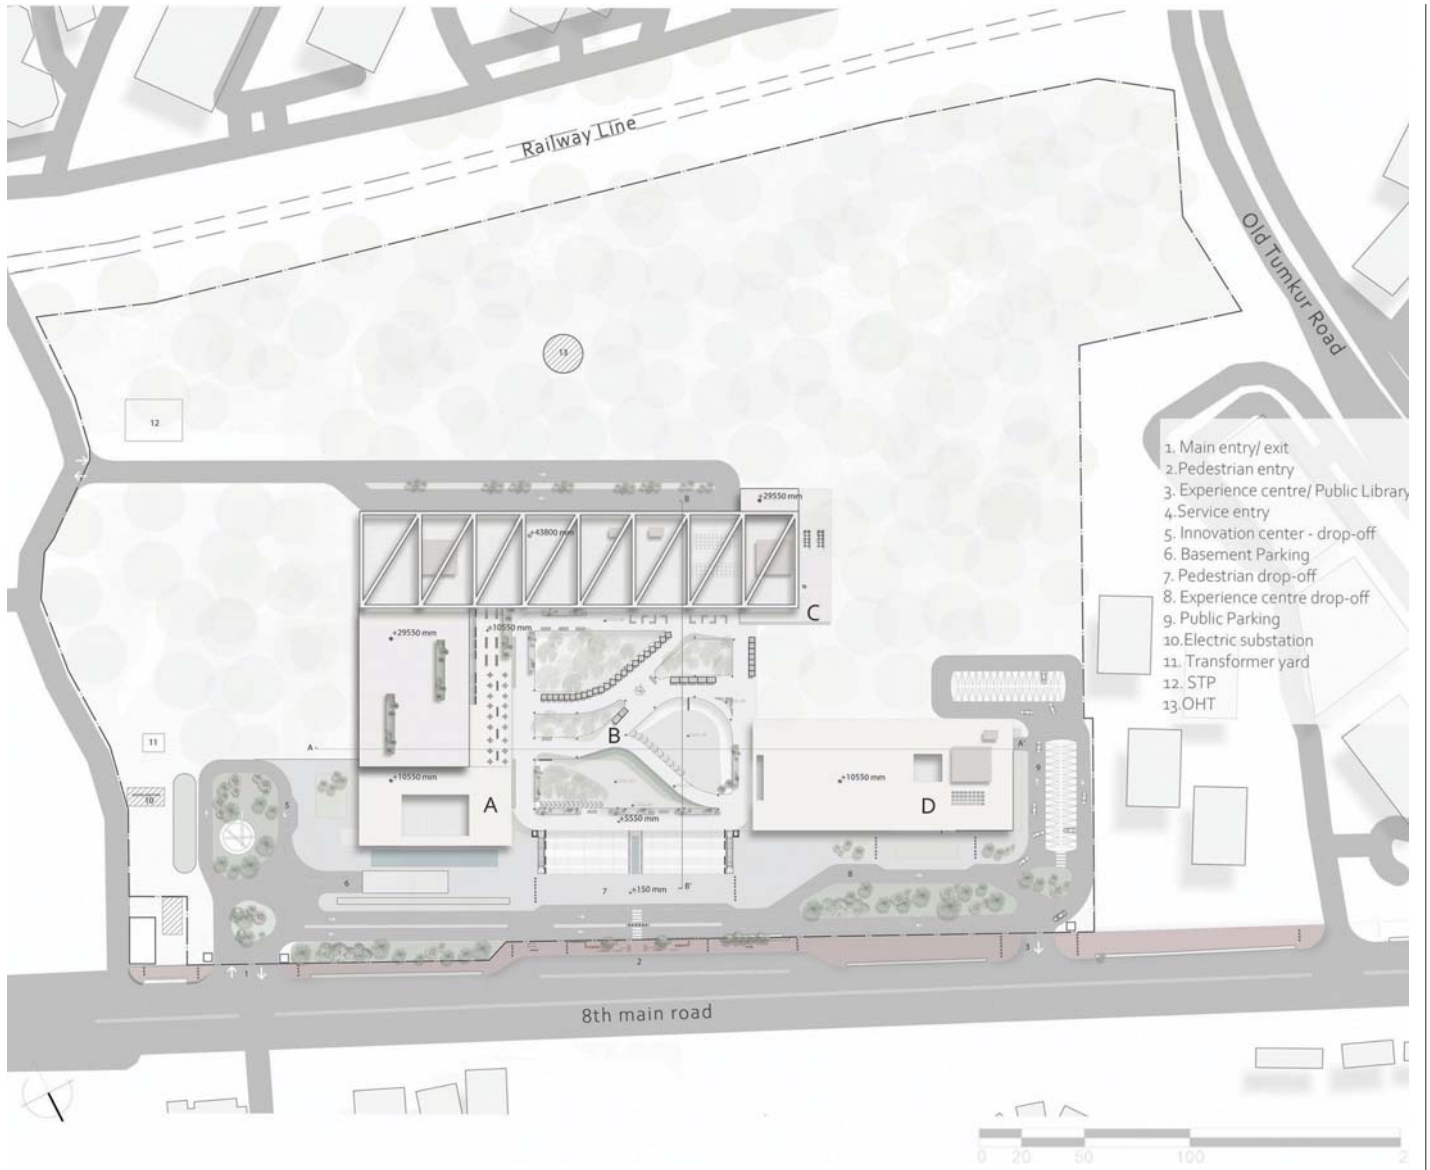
Proposed Intervention's Masterplan in Bengaluru
